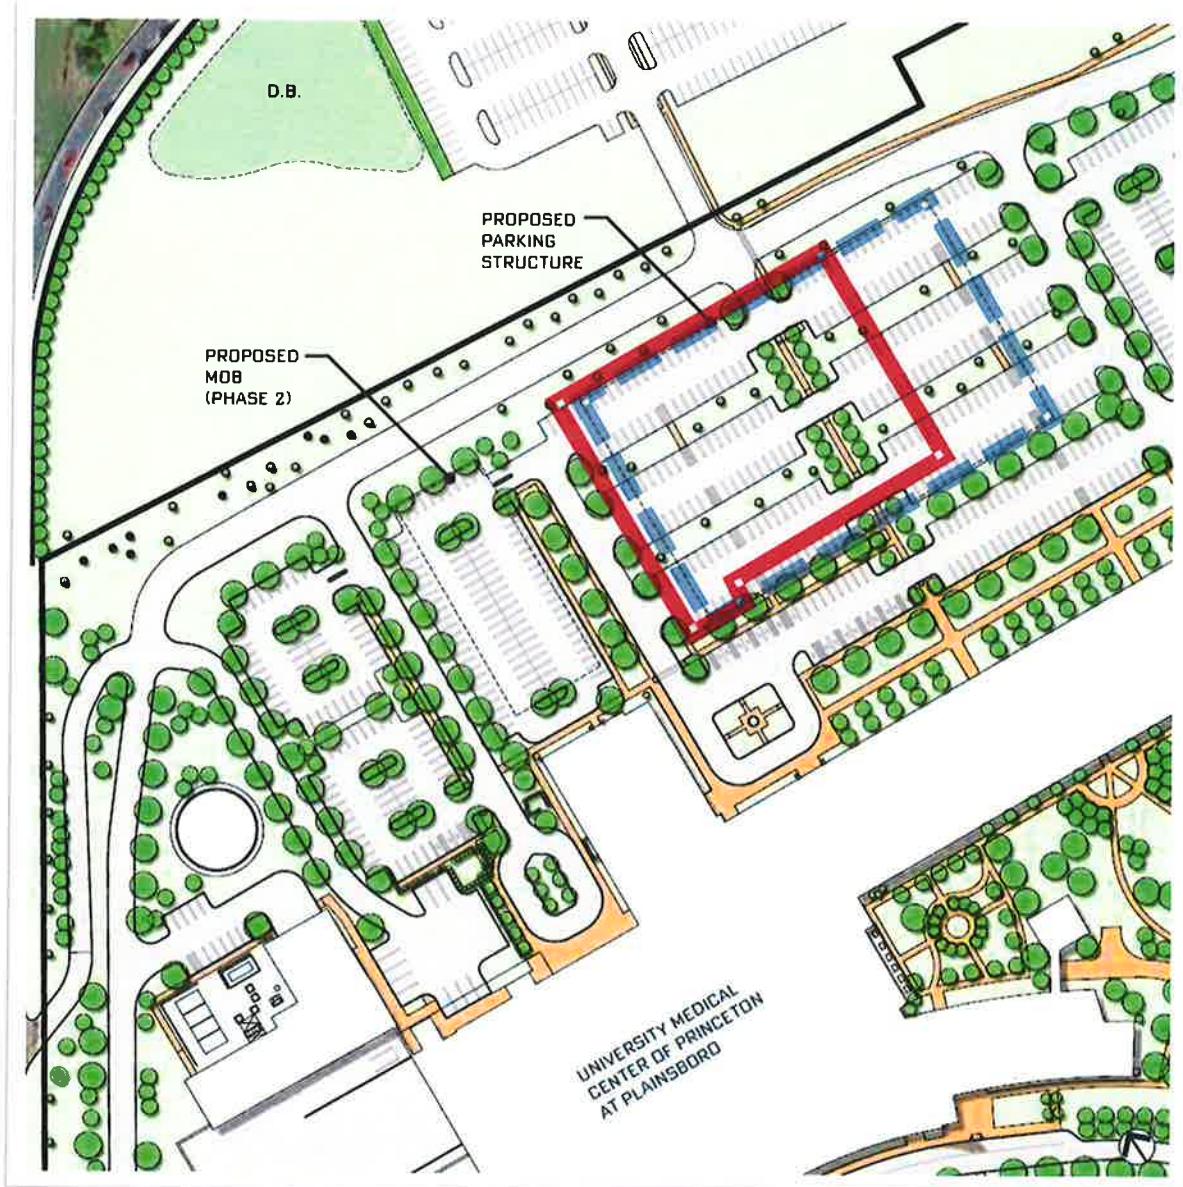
Exhibit B. Conceptual Site Plan in the Redevelopment Plan (Zoomed In)
